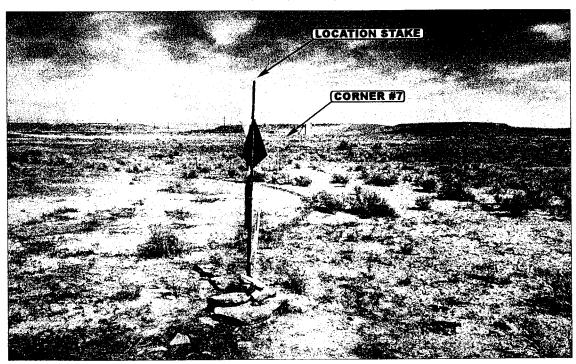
PHOTO: VIEW FROM LOCATION STAKE TO CORNER #7
